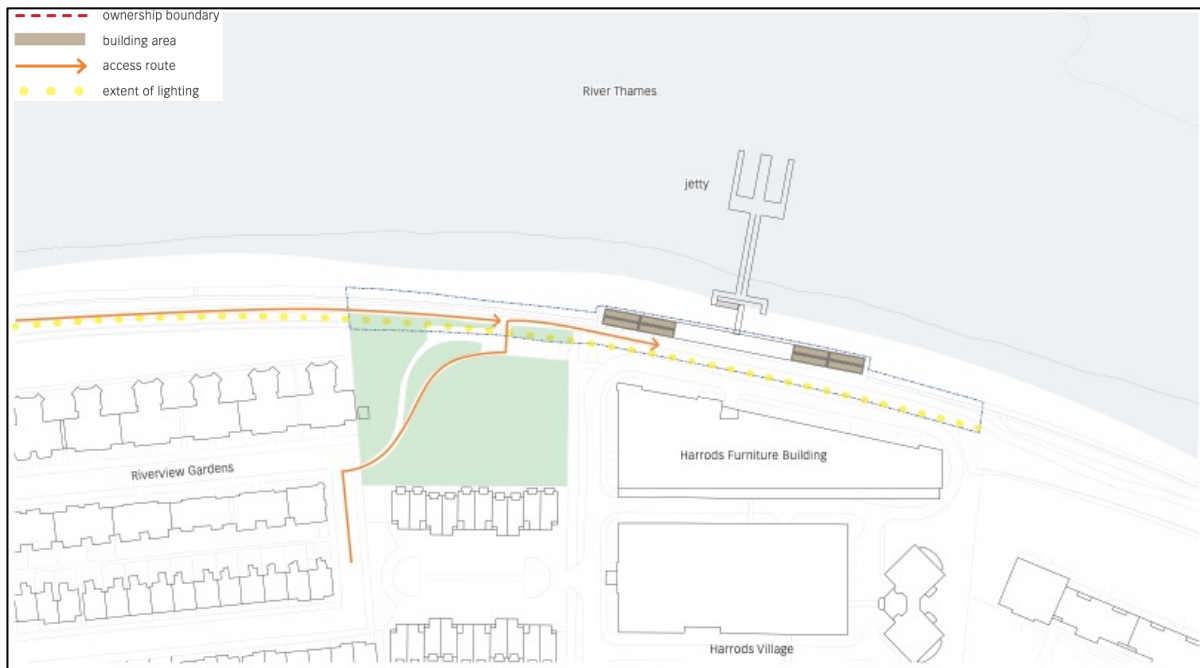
Site plan. Image provided by Lifschutz Davidson Sandilands Ltd.
